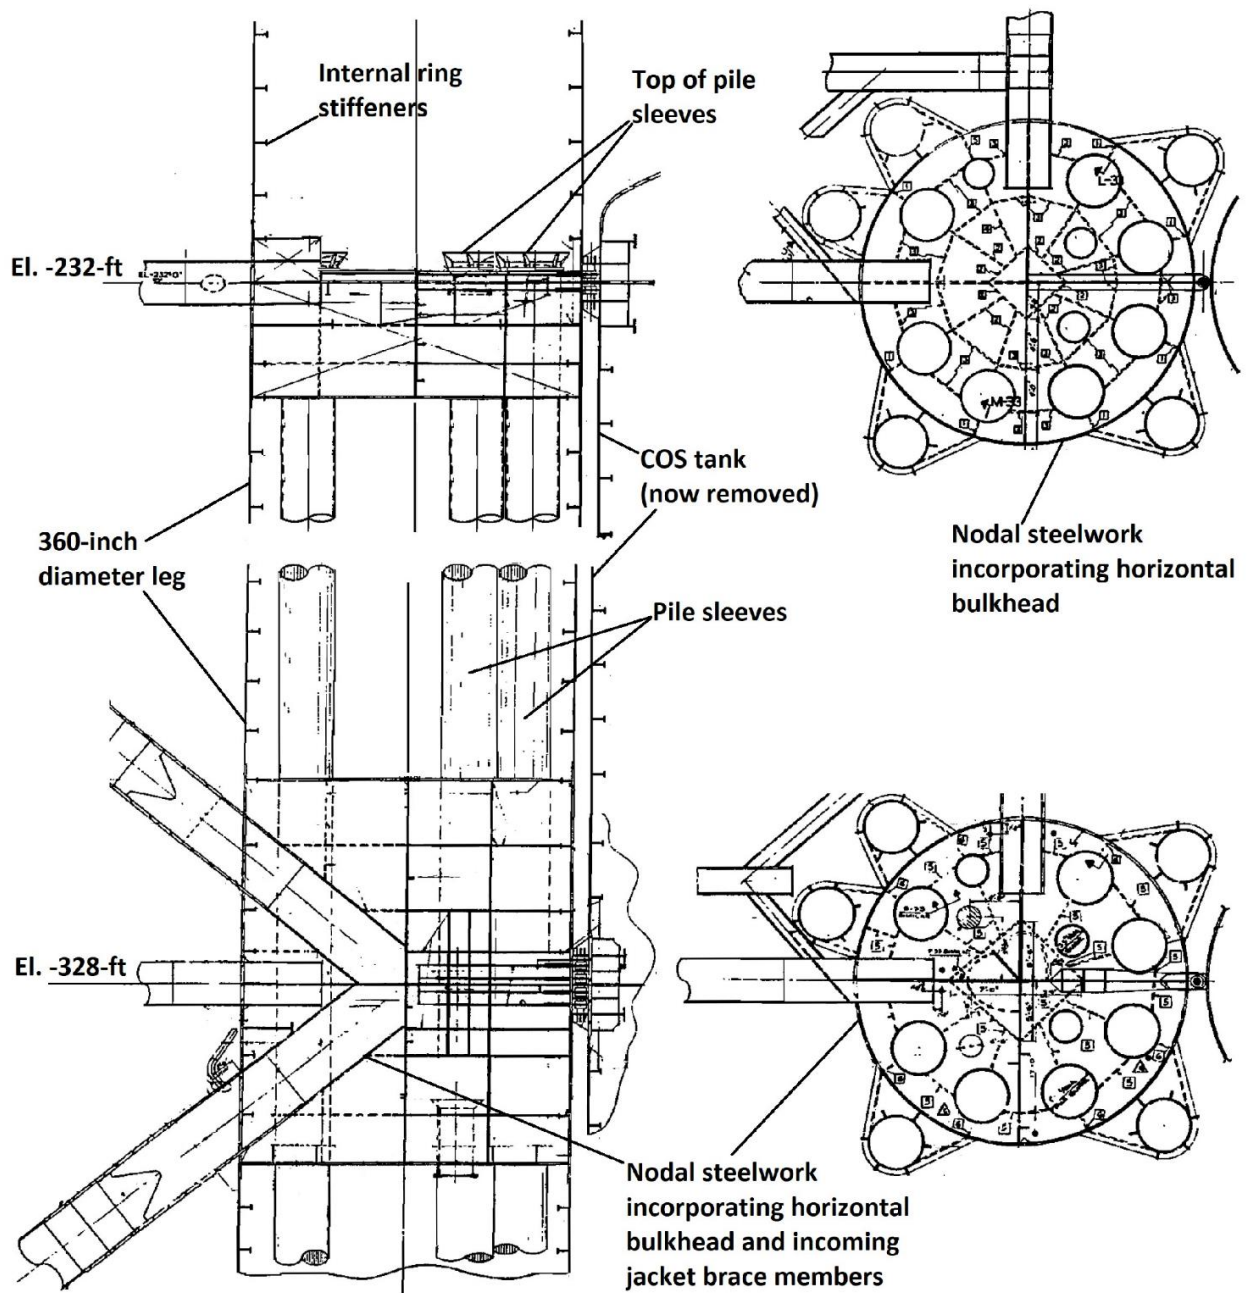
Thistle 'pontoon' leg sections (Frame 9)
